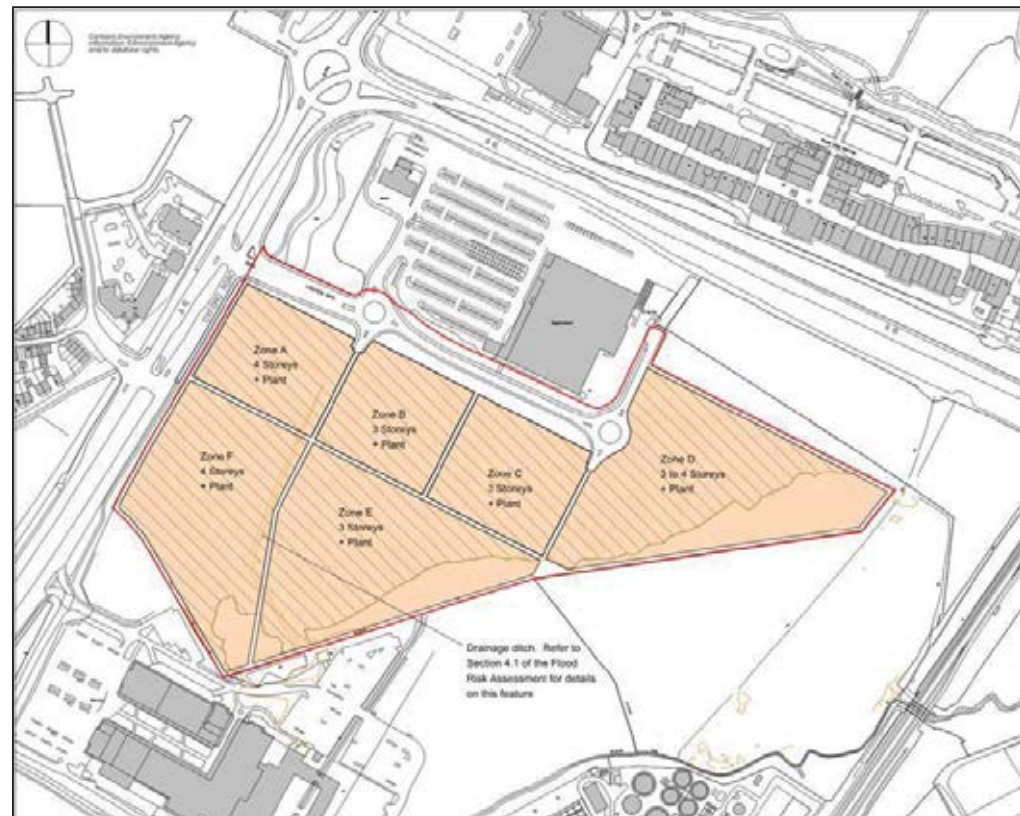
Proposed Development Parameters Plan (Drawing 1105\_P\_005 rev E, Bennetts Associates 30/11/17)
